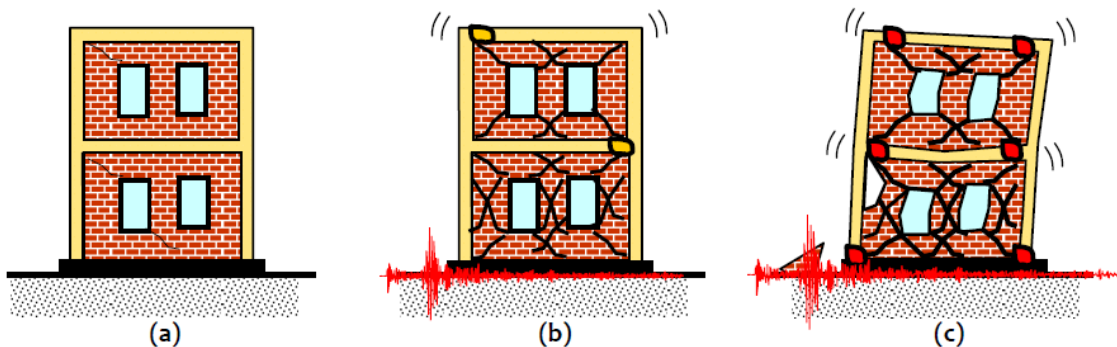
Earthquake-Resistant Design Philosophy for buildings: (a) Minor (Frequent) Shaking – No/Hardly any damage, (b) Moderate Shaking – Minor structural damage, and some non-structural damage, and (c) Severe (Infrequent) Shaking – Structural damage, but NO collapse
